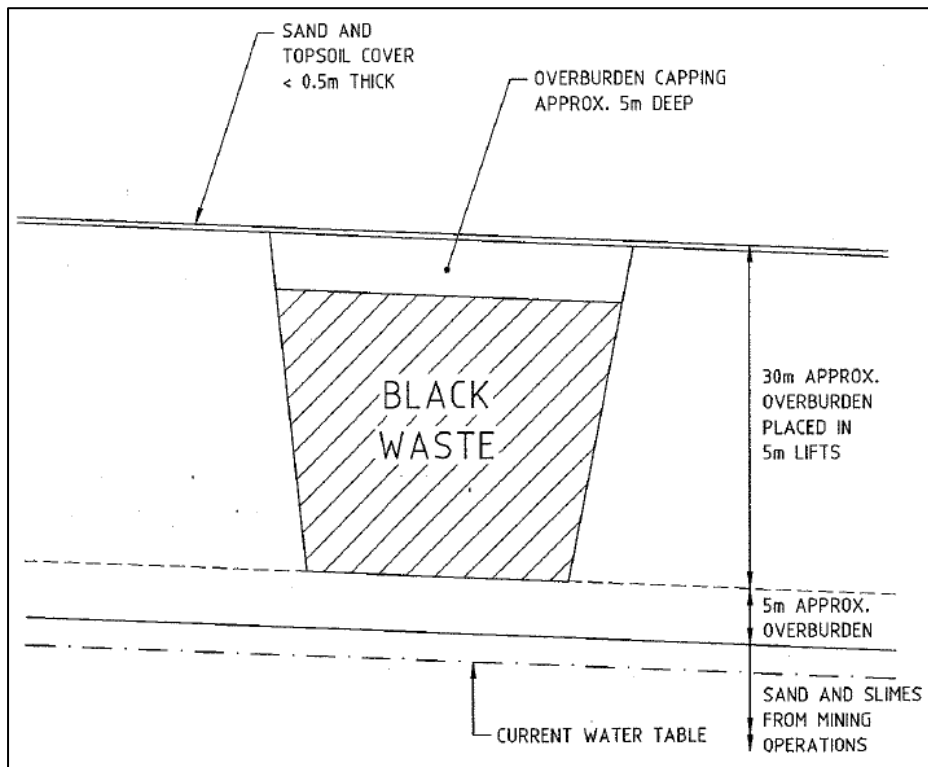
Typical arrangement of earlier waste pits (HGM, 1996).
